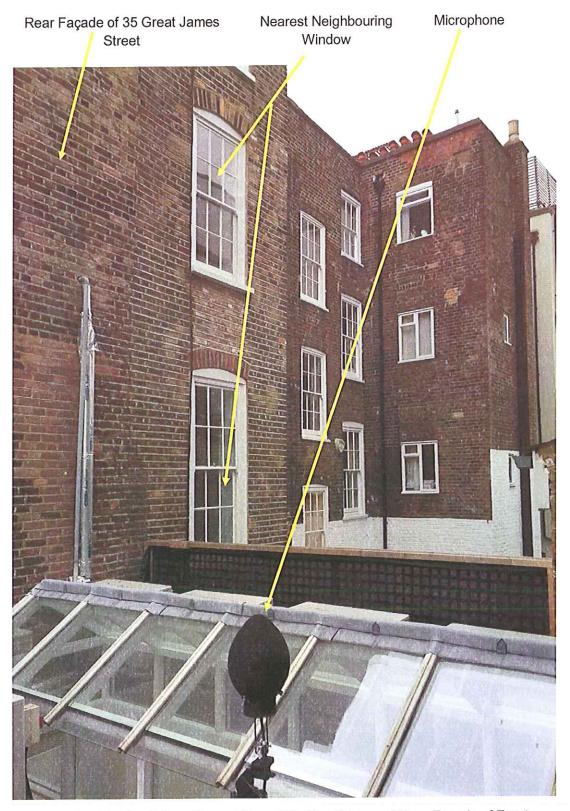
Photo B – Flat Roof Over Ground Floor With Rooflights and Rear Façade of Front Building
